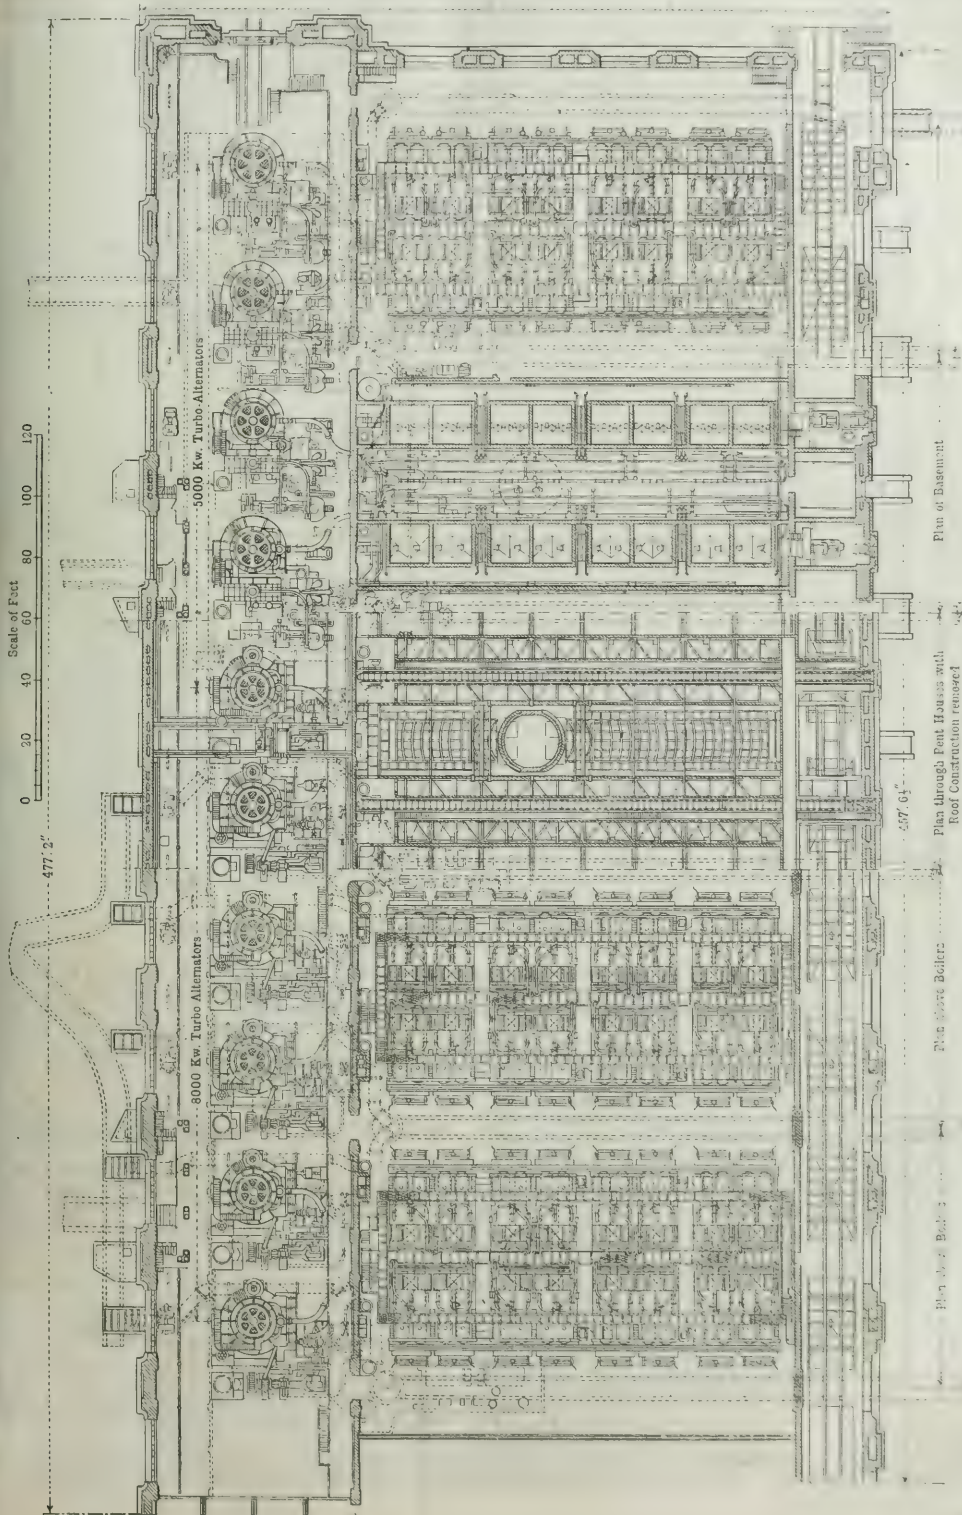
PLAN SHOWING GENERAL ARRANGEMENT OF PLANT IN FISK STREET STATION.
